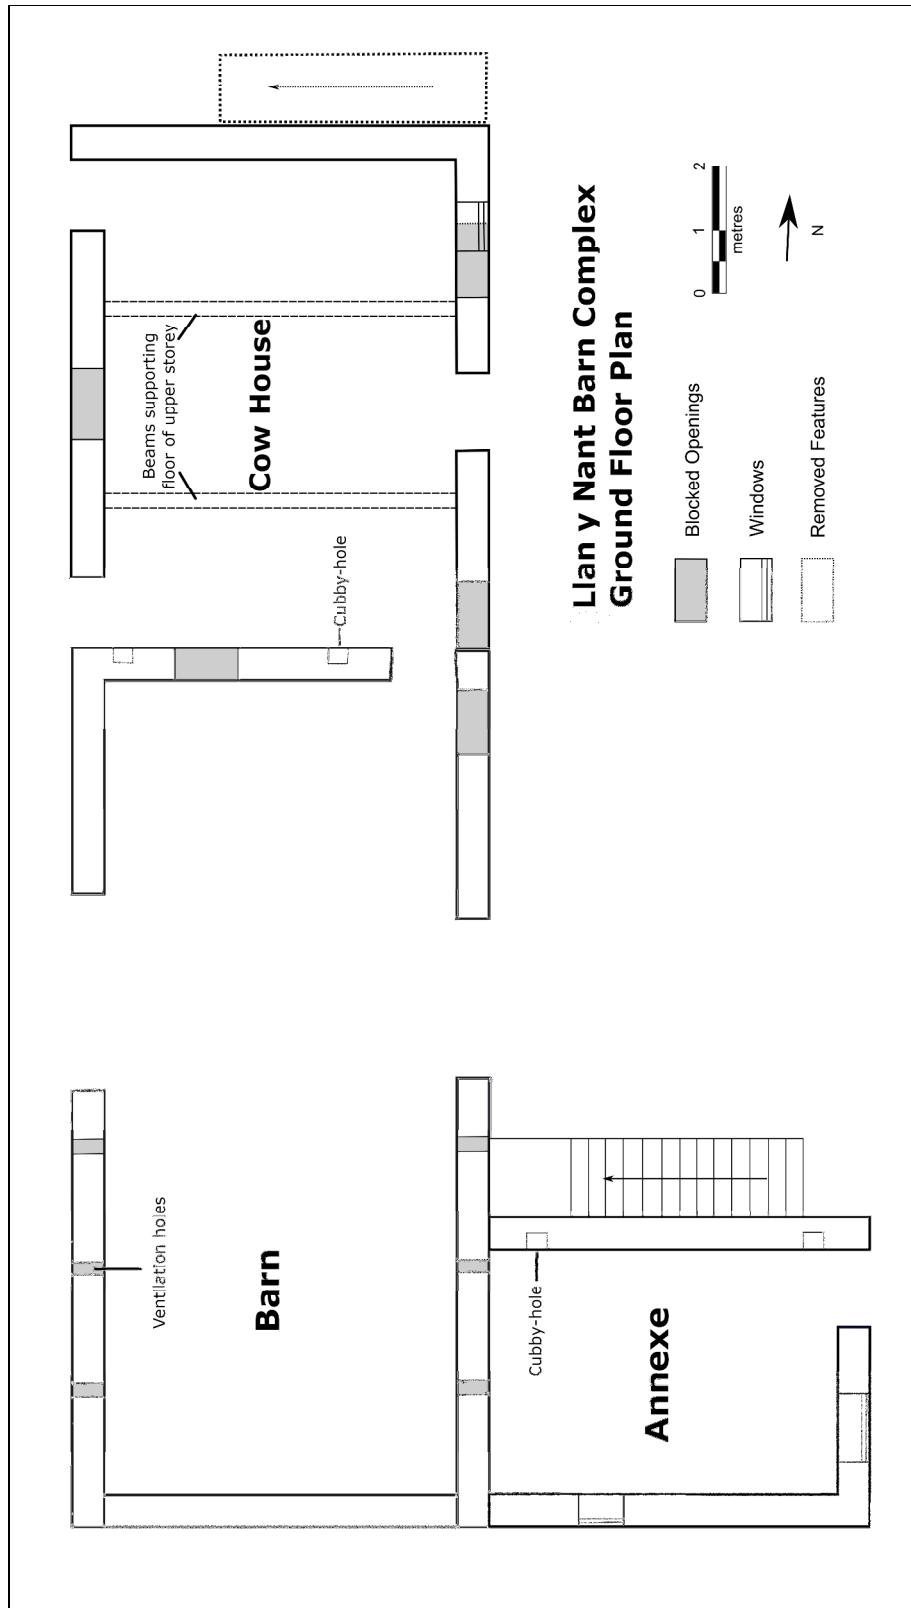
Ground floor plan of the Llan y Nant Barn complex
